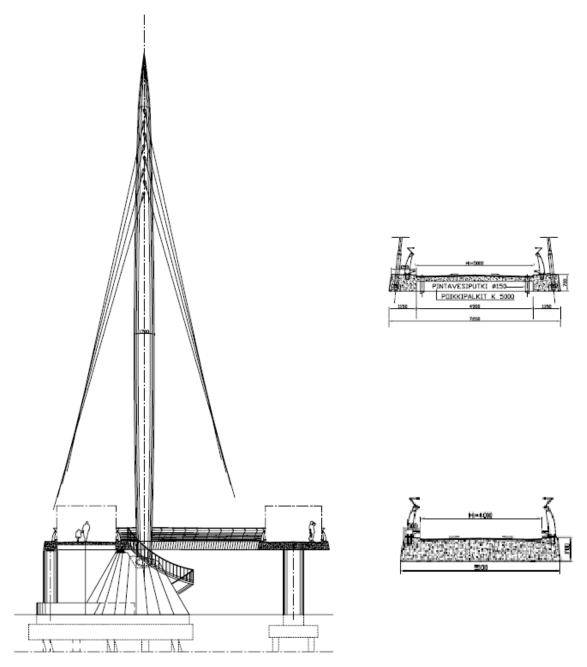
Longitudinal view and cross-sections of Bridge No. 3.
